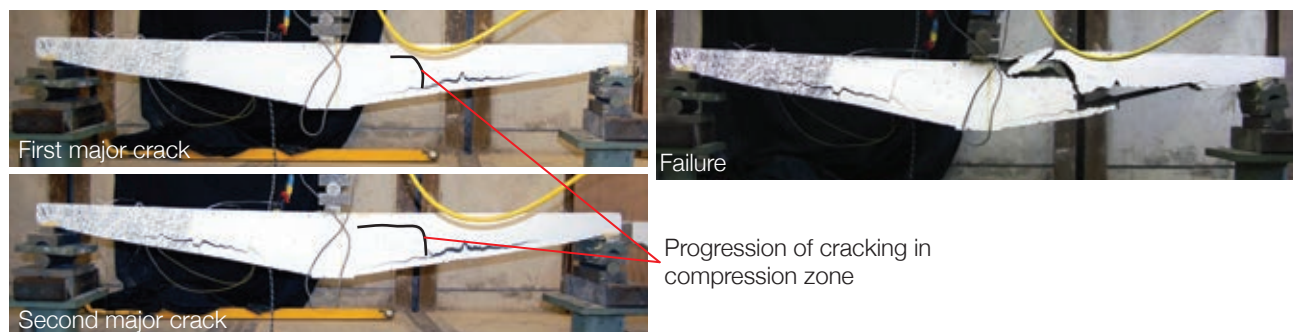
Major cracking (l) and failure (r) of Beam 9\_1\_CFP\_V.
